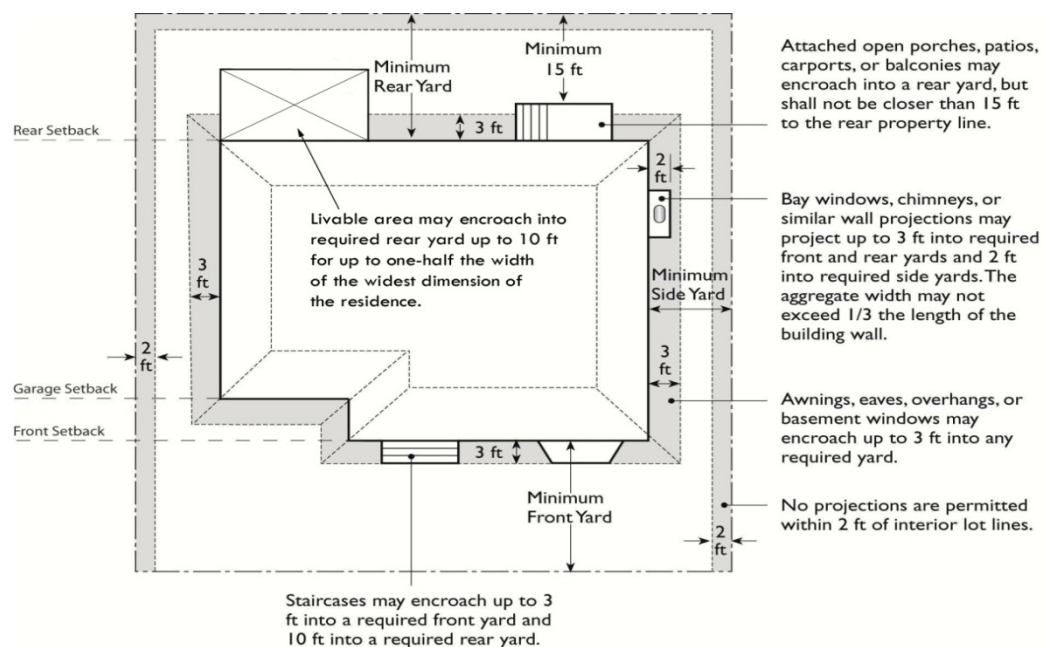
B(2): BUILDING PROJECTION
